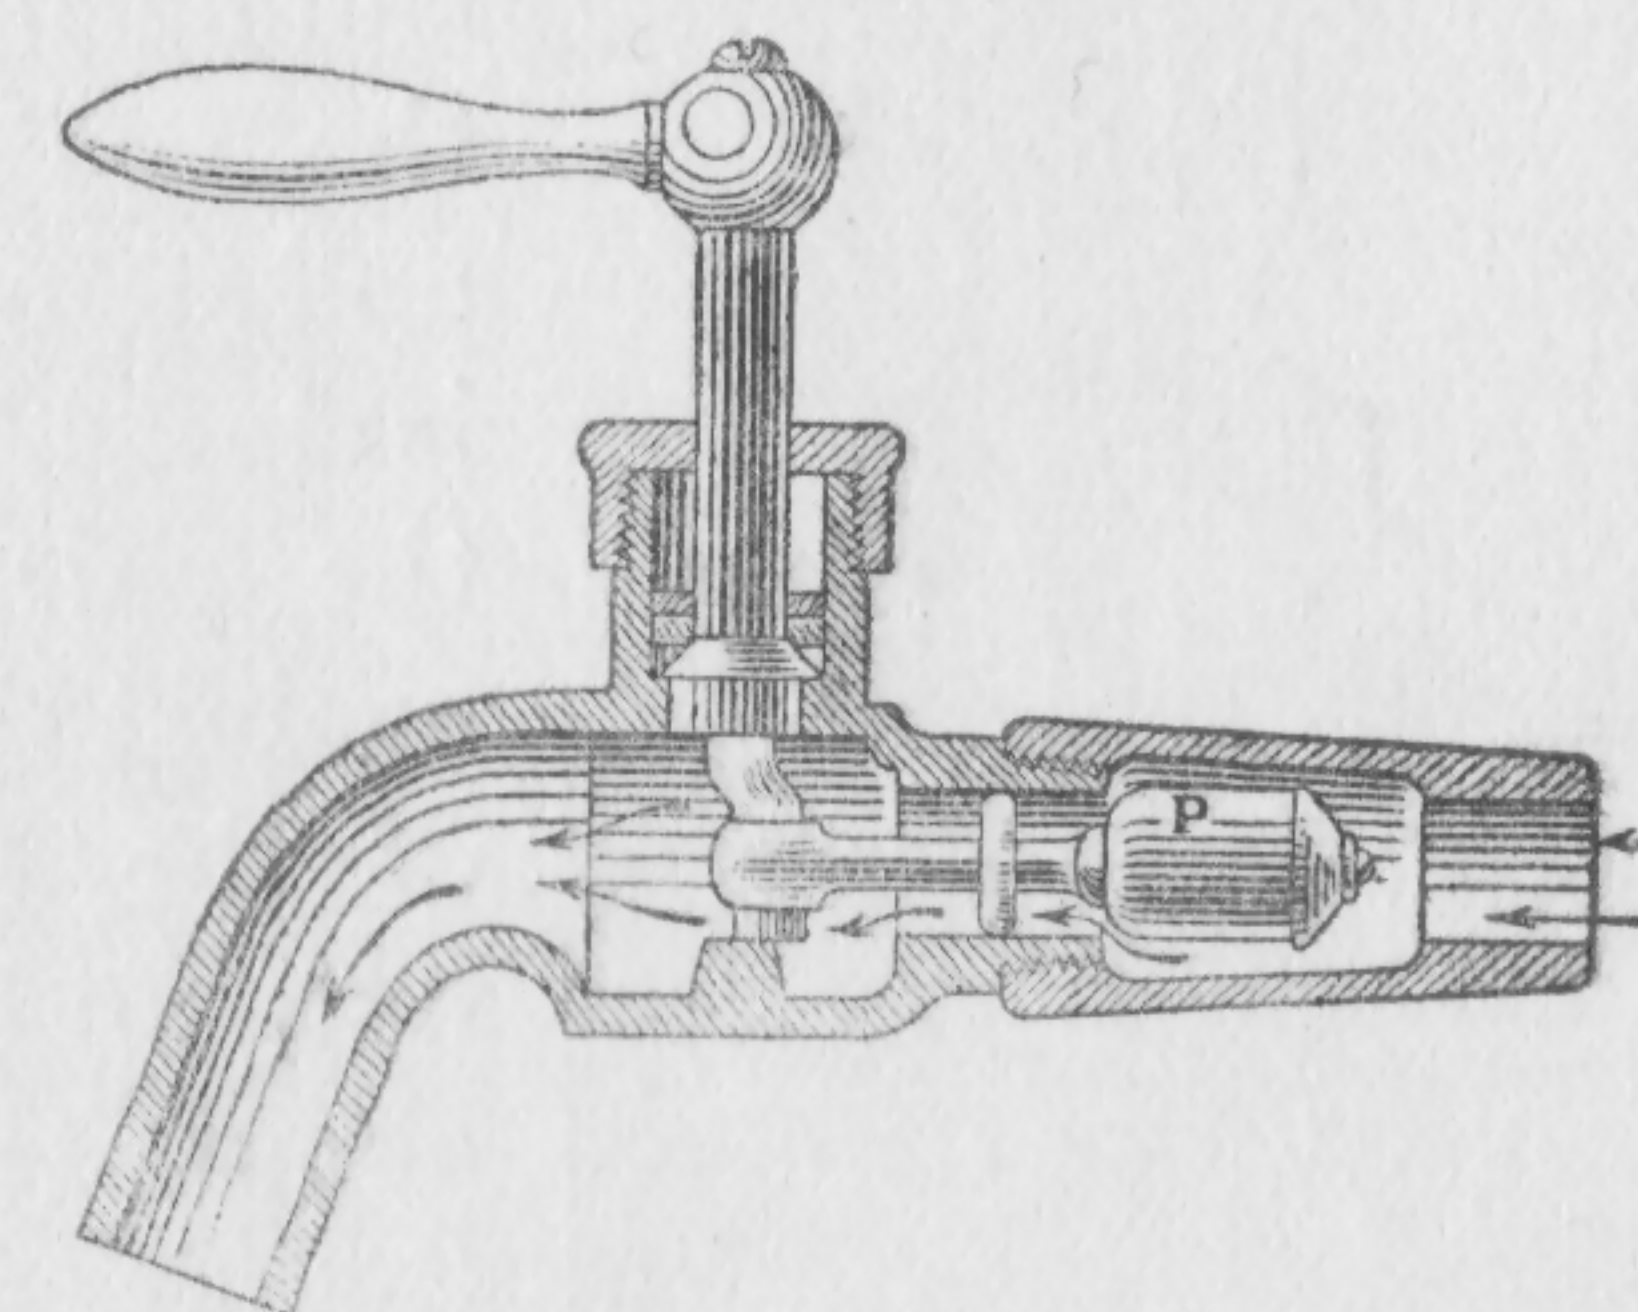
Section through a Fuller type of faucet, in which the eccentric on the stem draws the rubber plunger *P* against its seat, to cut off the flow.
